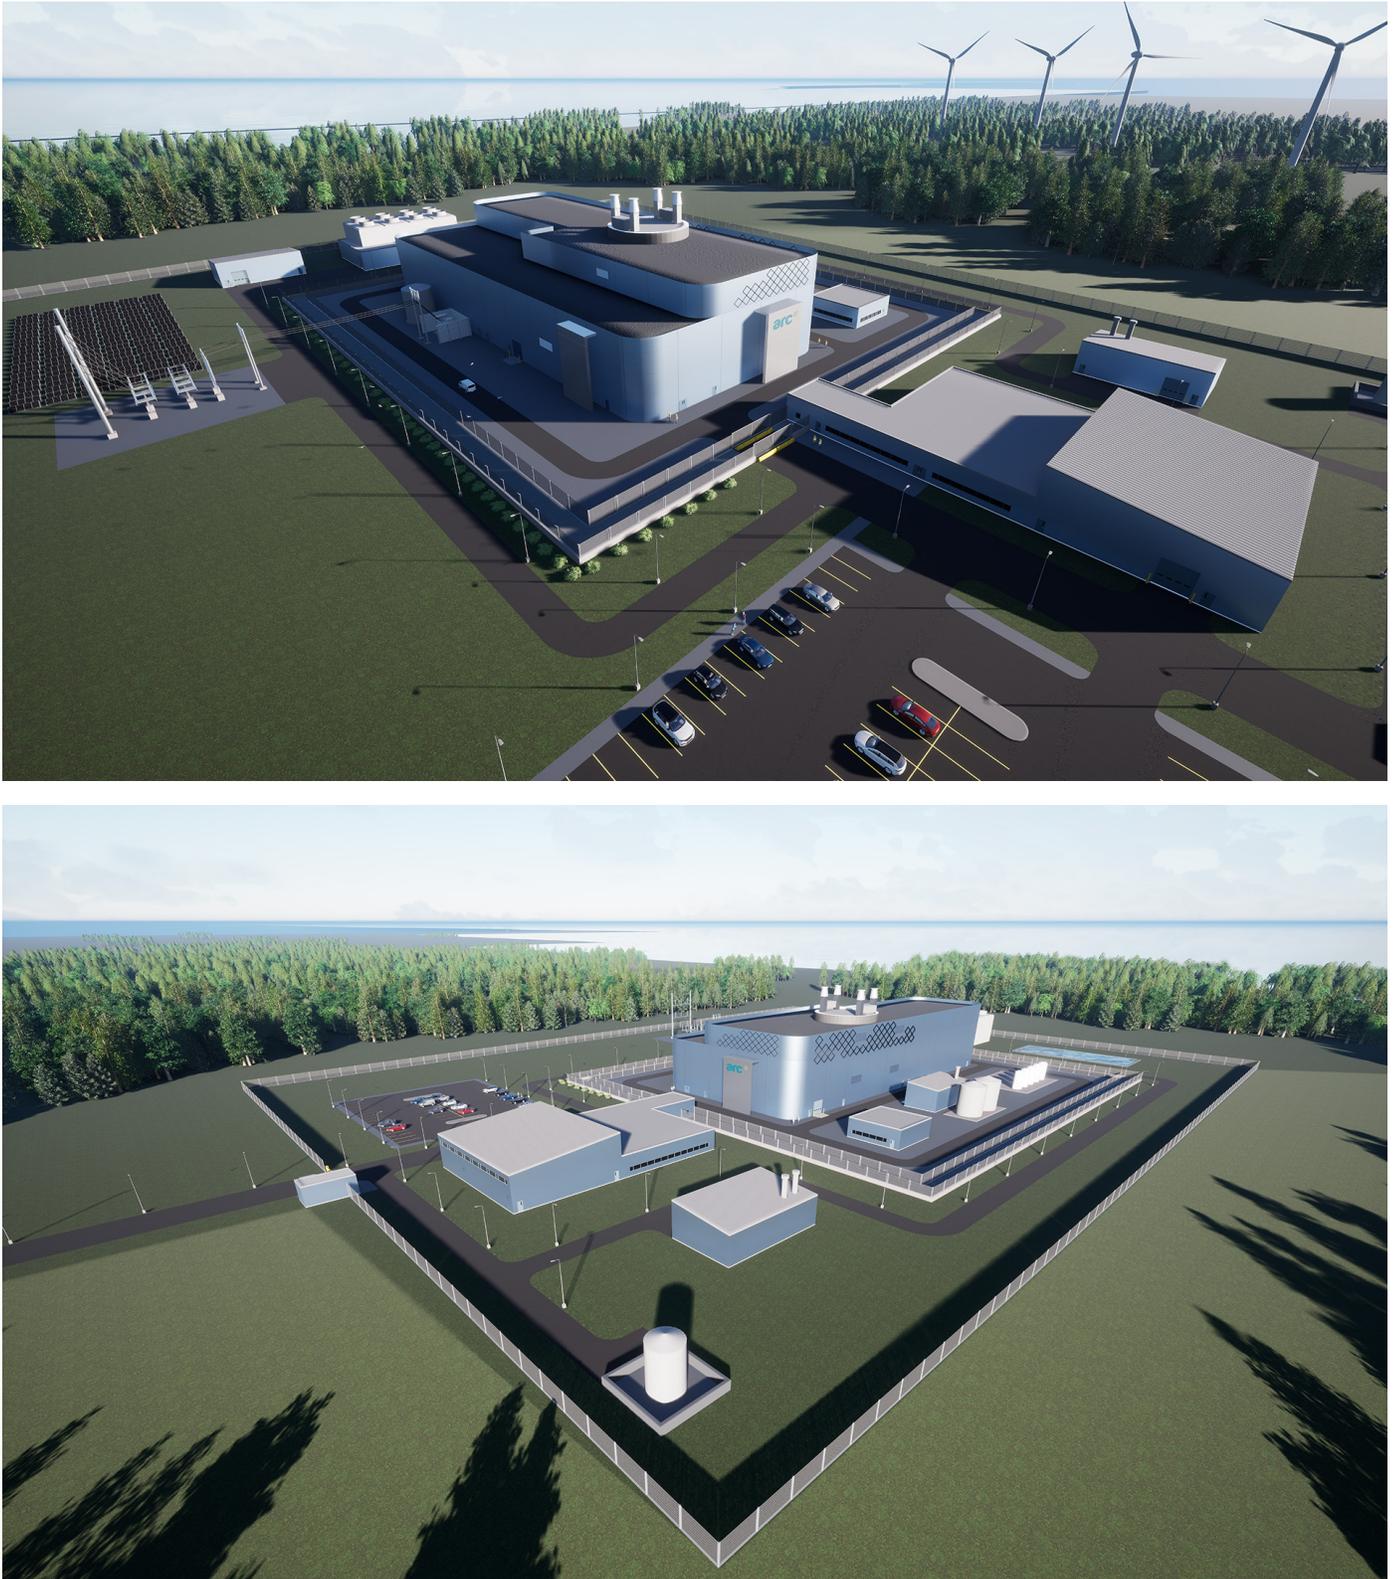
ARC-100 Aerial Views of Standard Plant Site Layout
